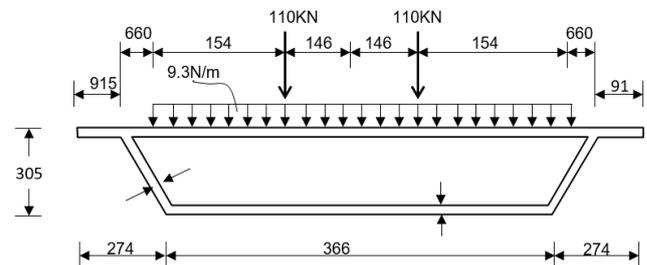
Mono-symmetric box girder (the bridge is span 50m between piers)
